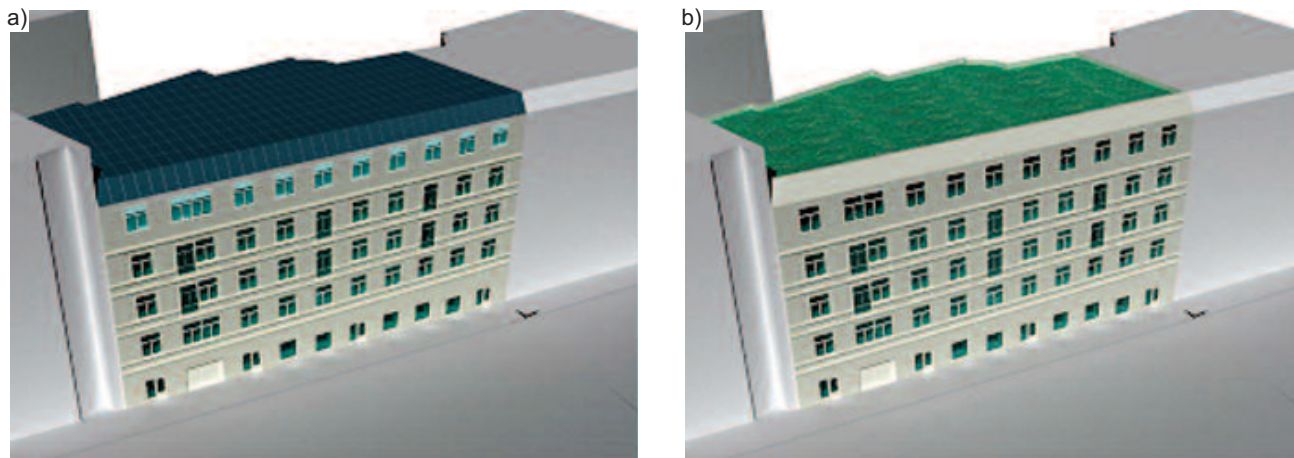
Visualization of two proposals for building extension: a) roof covered with photovoltaic panels; b) extensive green roof
